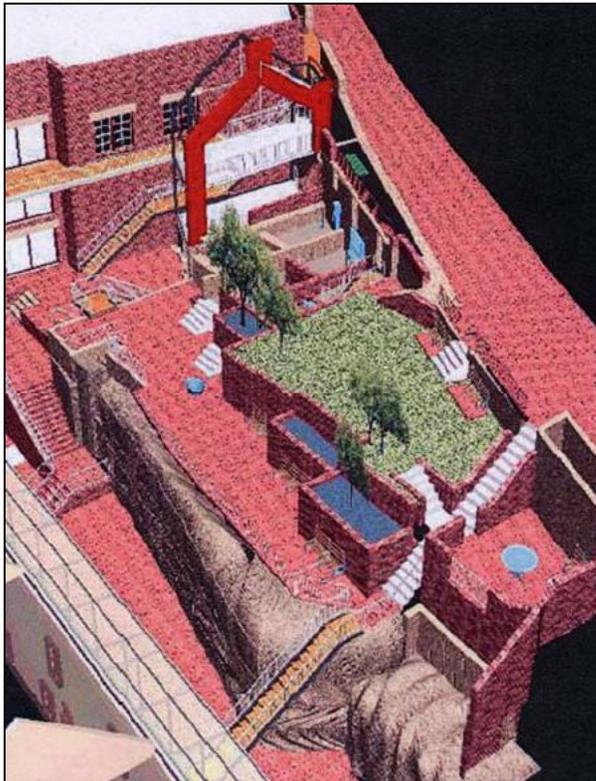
CAD image of Foundation Park showing the terraced layout, features, connections and stairs.
